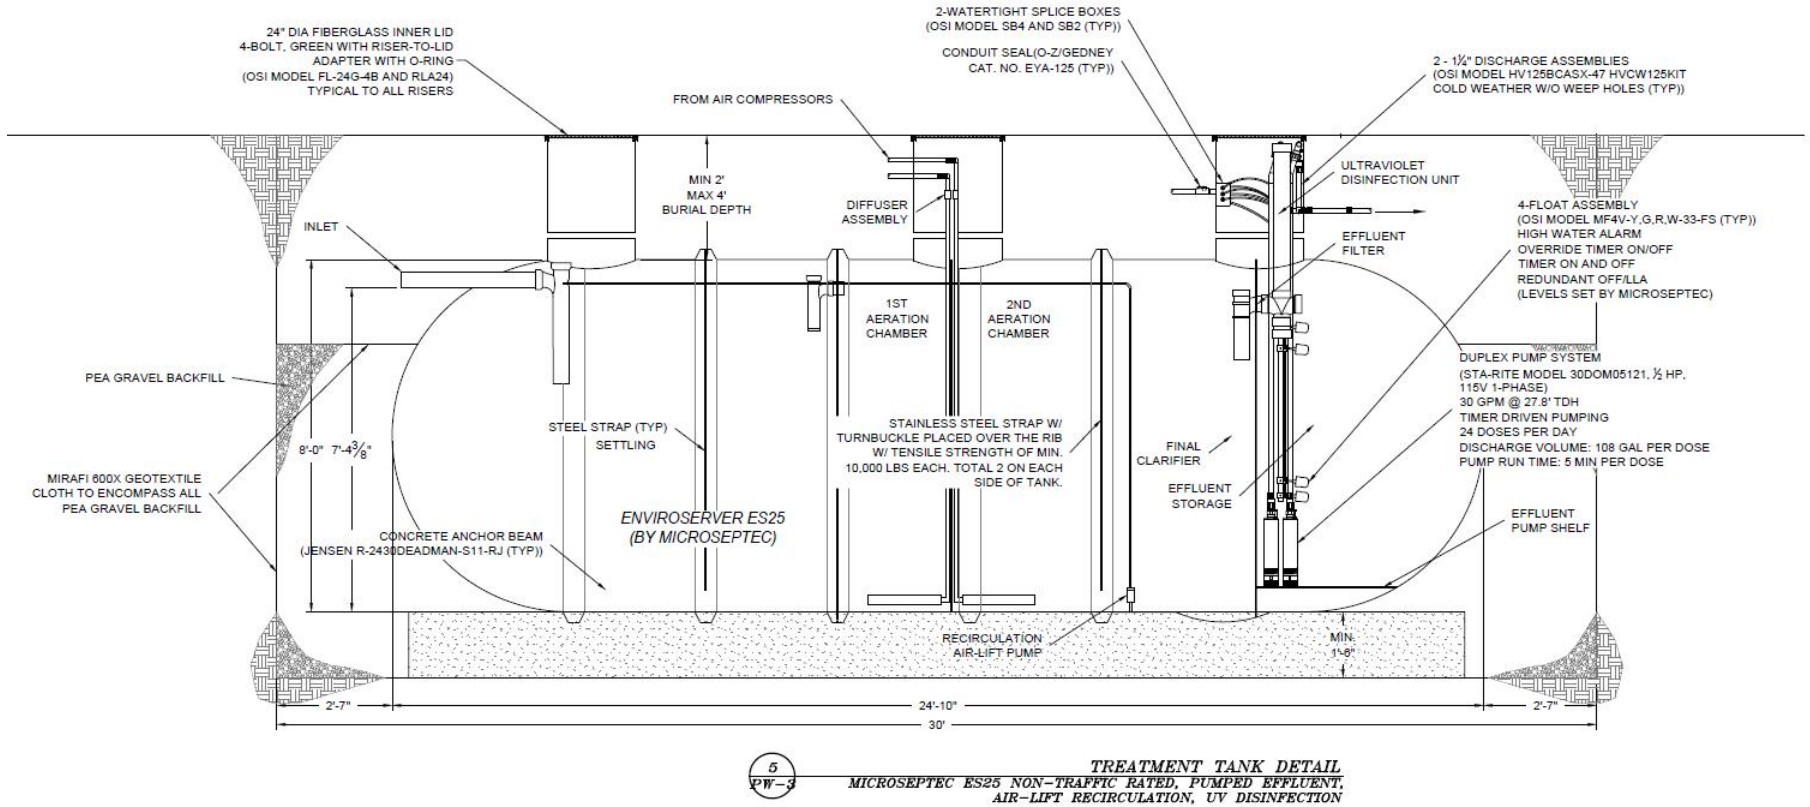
Advanced Onsite Wastewater Treatment System Cross Section
